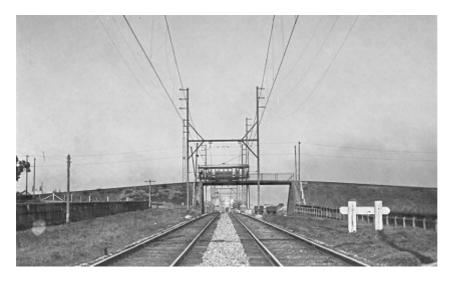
Miller Street tram bridge over railway near Preston Depot. Darebin Historical Encyclopedia
